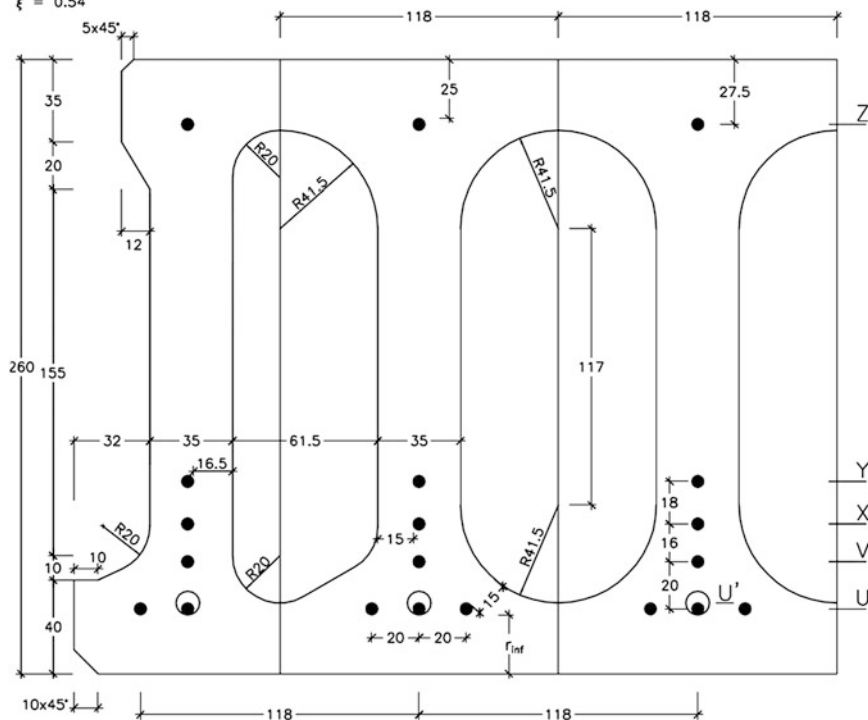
Cross-section of HCS. Dimensions in millimeters
